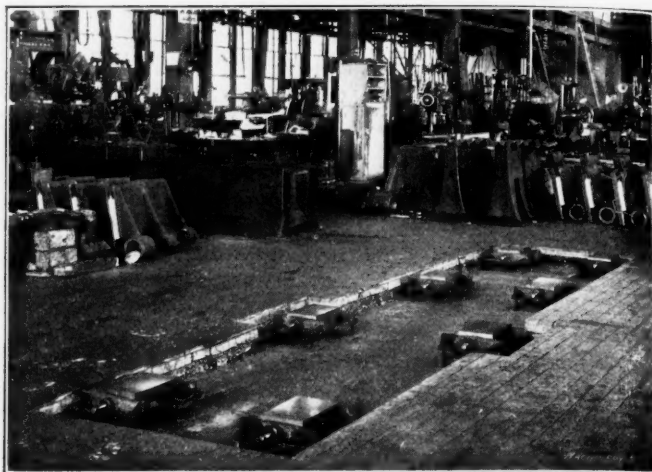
Concrete Block Foundations for Planer, with Adjusting Plates in Position and ready for the Concrete Filling.
